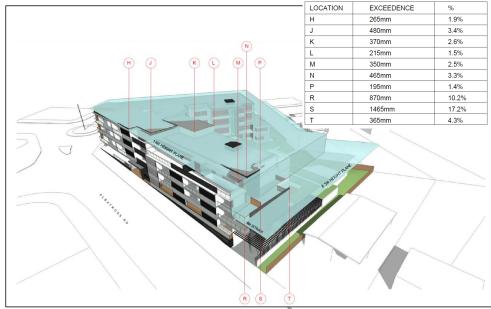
Height Plane instructions relating to the 14.0m (N2) and 8.5m (I2) maximum building height - southwestern view from Albatross Street.
